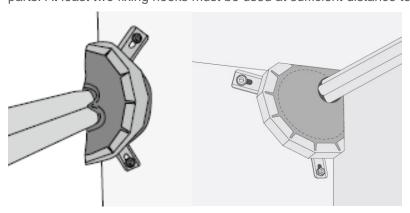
Installation of ½ and ¾ of Hilti Firestop Cable Collar CFS-CC
